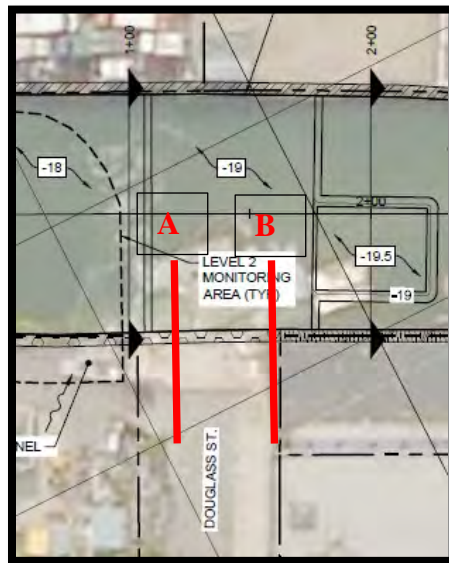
Douglass Street (West) Canal Side Plan View (Reference 4)
